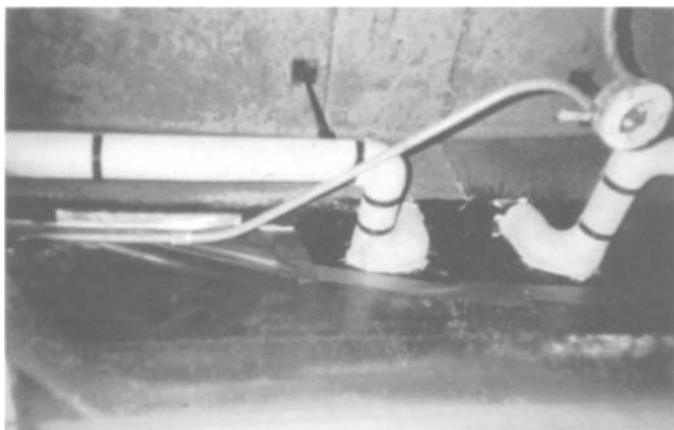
Pipes underneath floor slab connect to a heating unit above.
